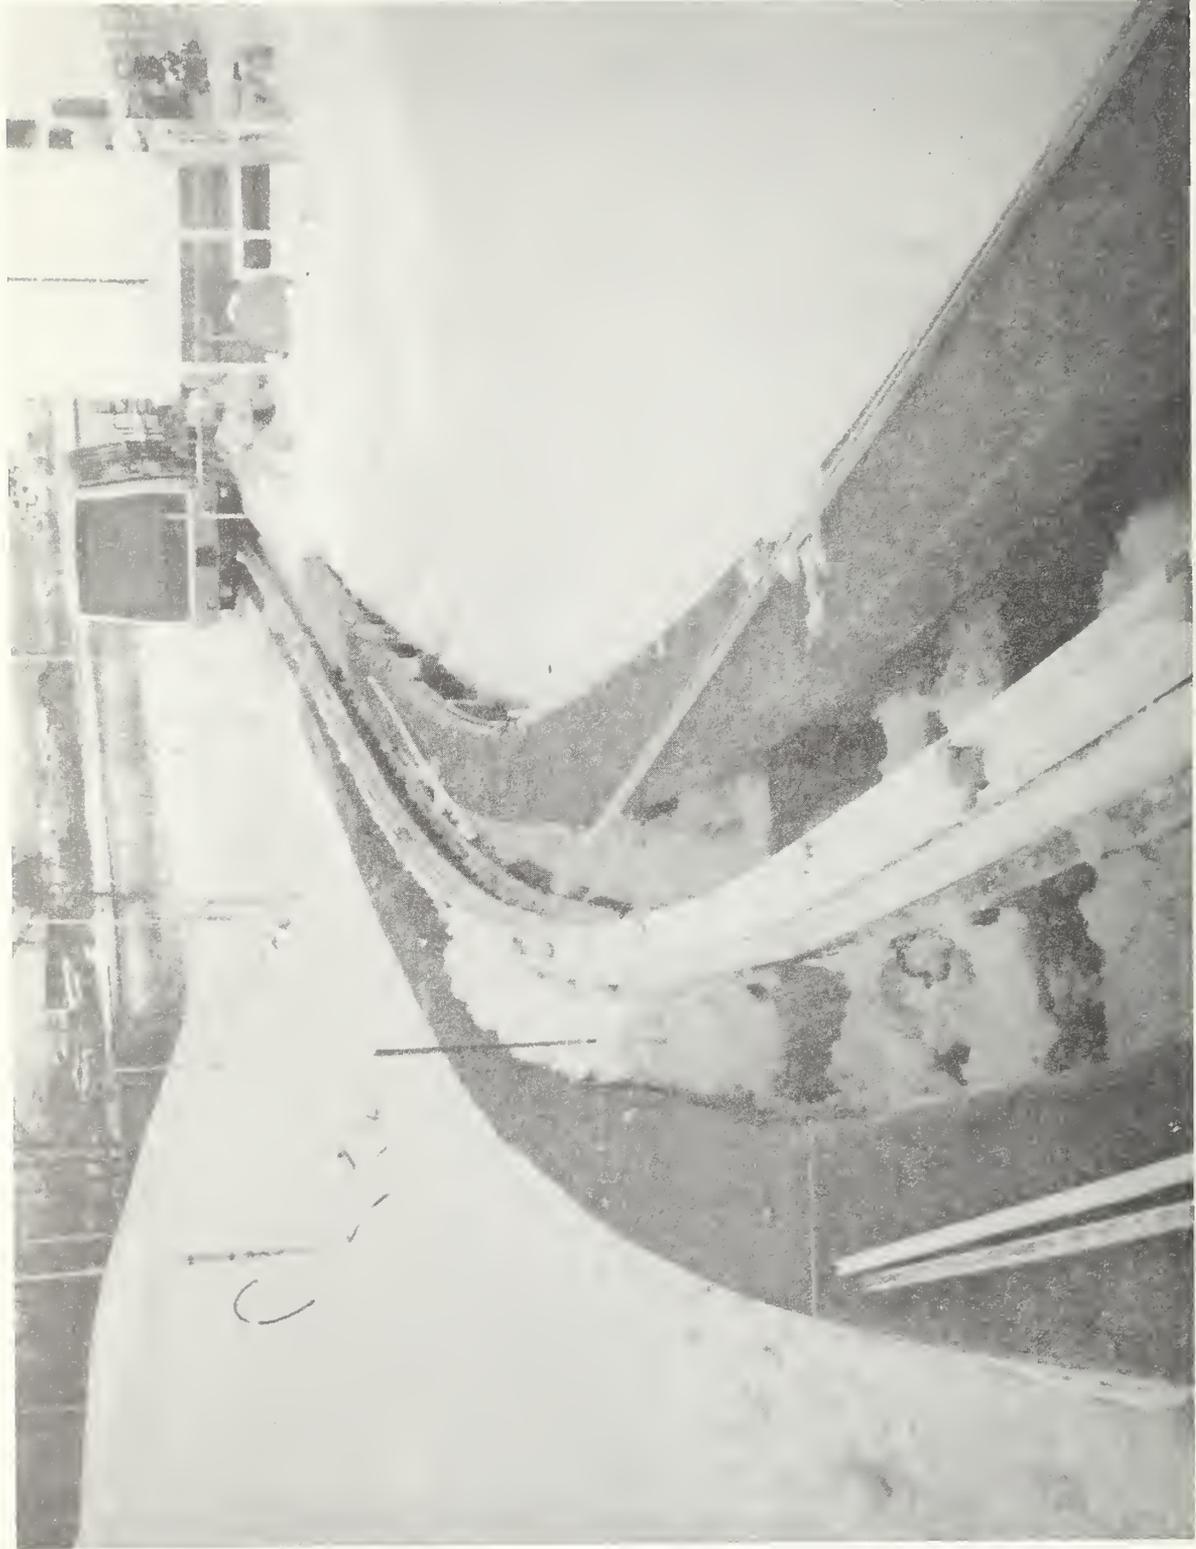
PORTION OF GUIDEWAY EXTENSION AT WESTINGHOUSE TEST TRACK
